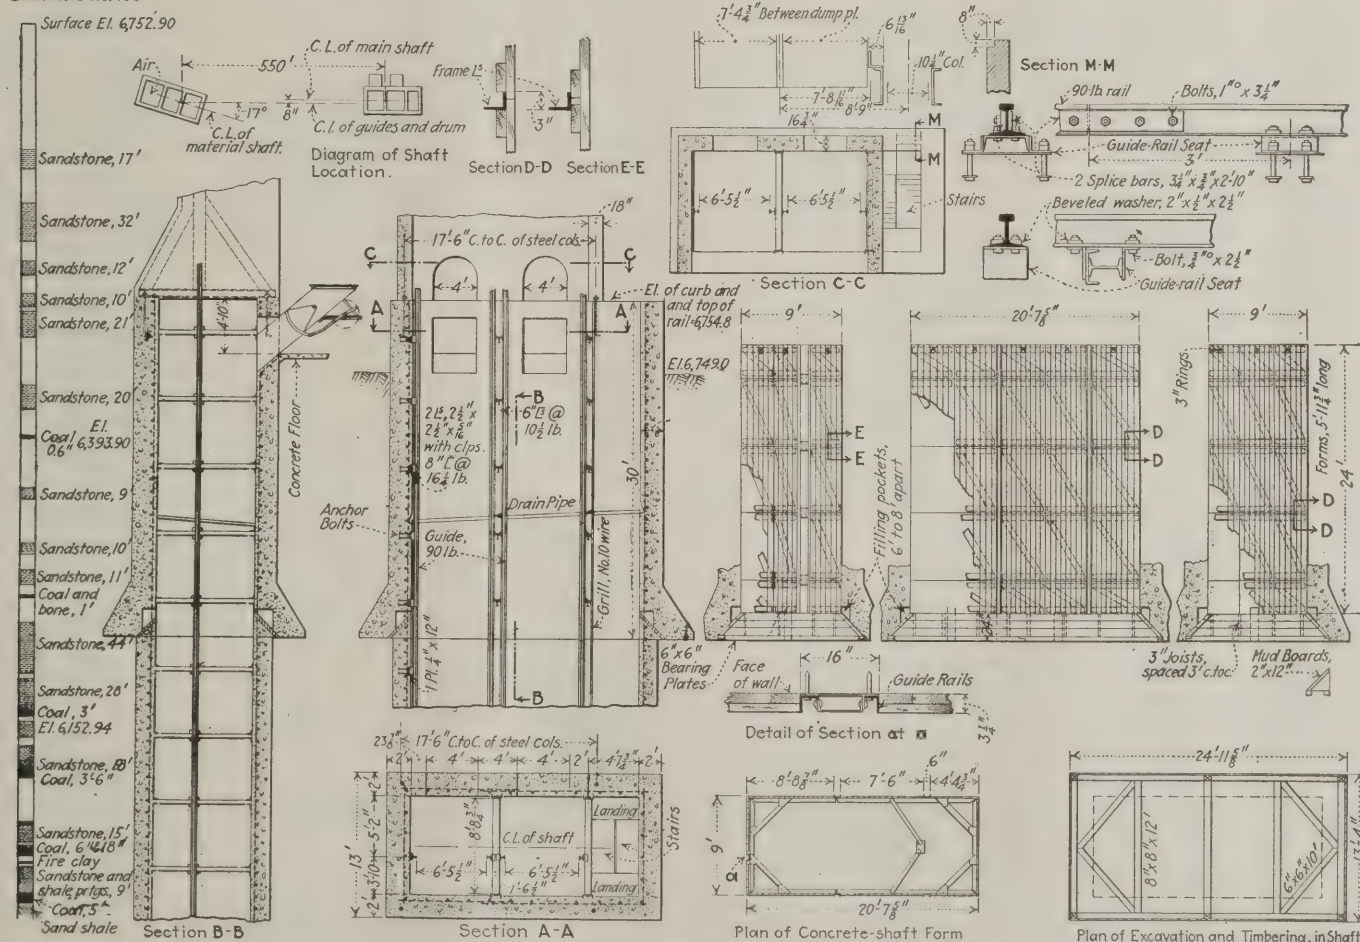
CONSTRUCTION PLAN OF THE MAIN SHAFT WITH DETAILS OF GUIDES, BUNTONS AND CONCRETE FORMS
